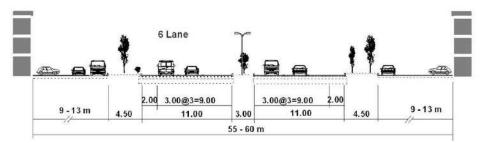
Proposed Typical Cross Section for National Road/ Trunk Road
